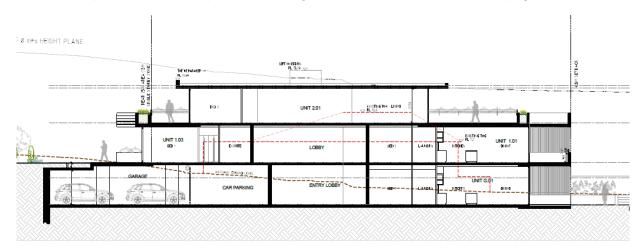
Section A plan DA300 extract showing the 3 storey building elements
